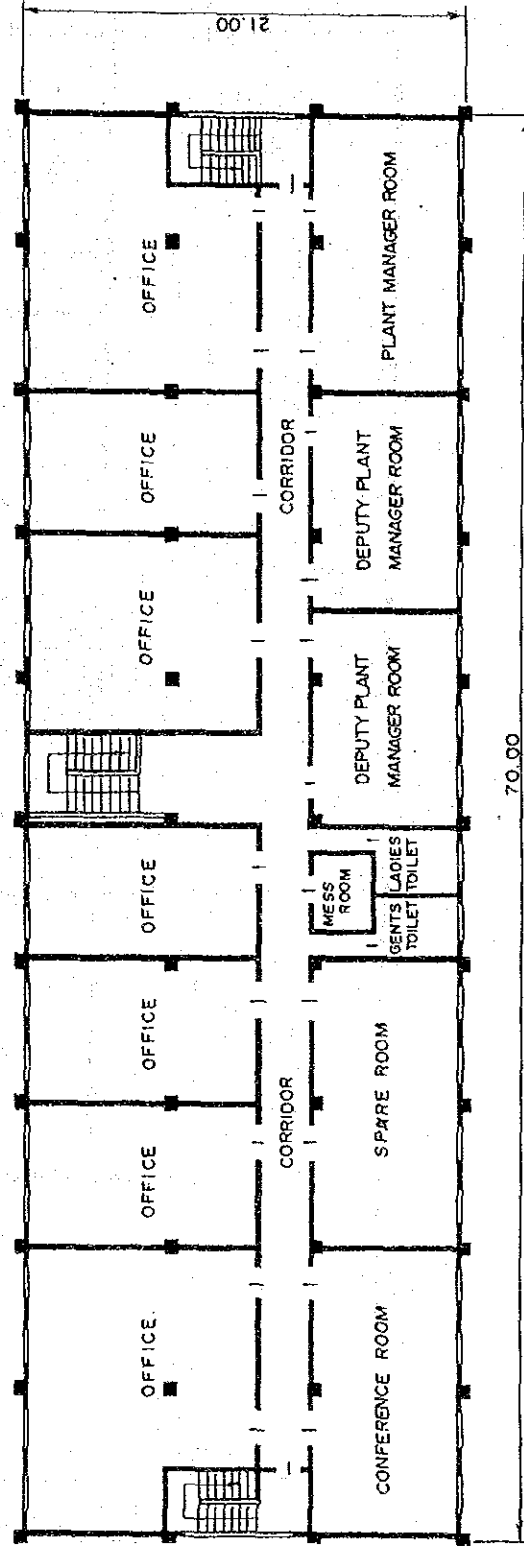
ADMINISTRATION BUILDING PLAN
